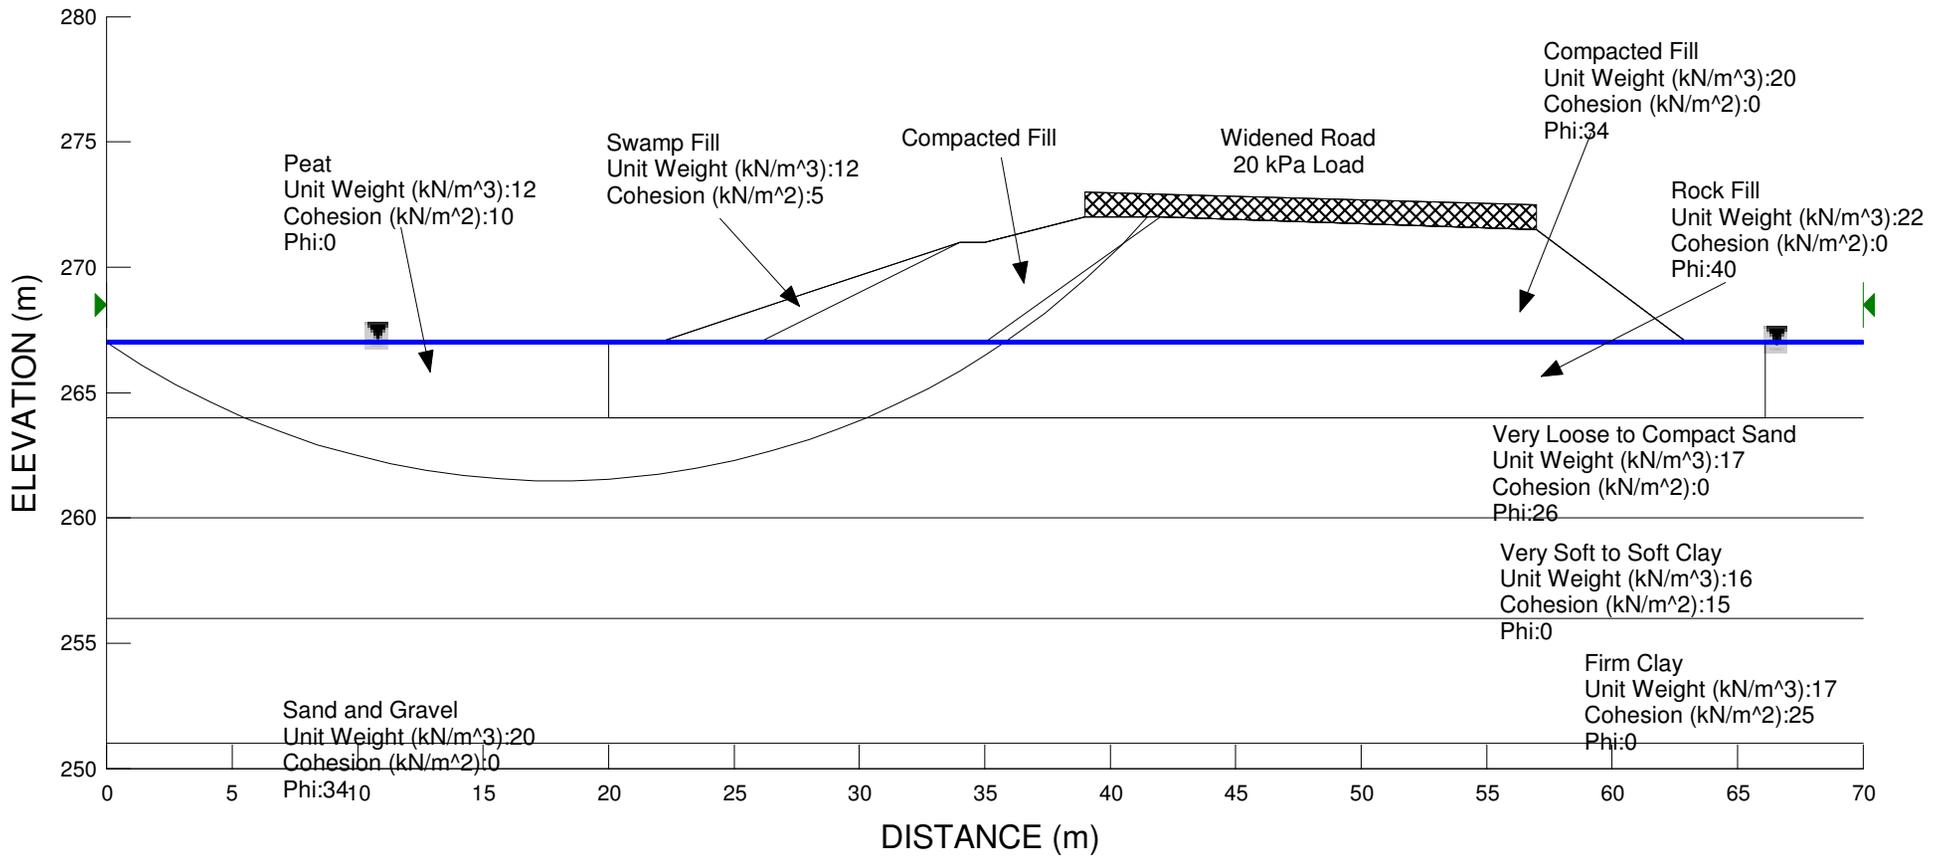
Slope Stability Analysis of Section at Station 18+730 with 3 m Road Widening (End of Construction - Shallow Slip Surface)
